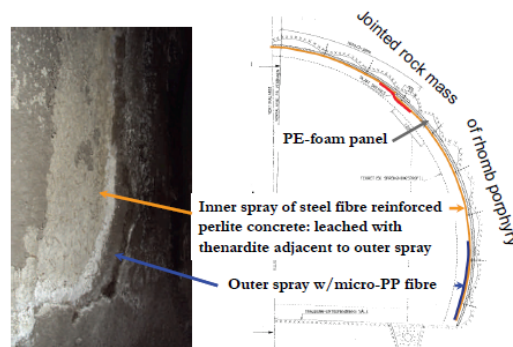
Cross section showing three layers of sprayed concrete: 1) inner light colored 1988 perlite concrete with internal spalling due to extensive carbonation and destructive steel fiber corrosion, followed by 2002 concrete; 2) grey sprayed concrete with micro-PP fibers and 3) outer dark sprayed concrete without fibers. Breath of photo is about 50 cm.
